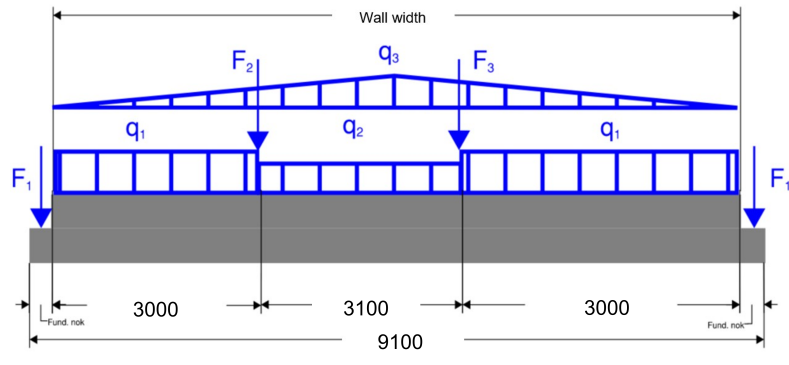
Forces on the longitudinal foundation beams of 9.1 meters
